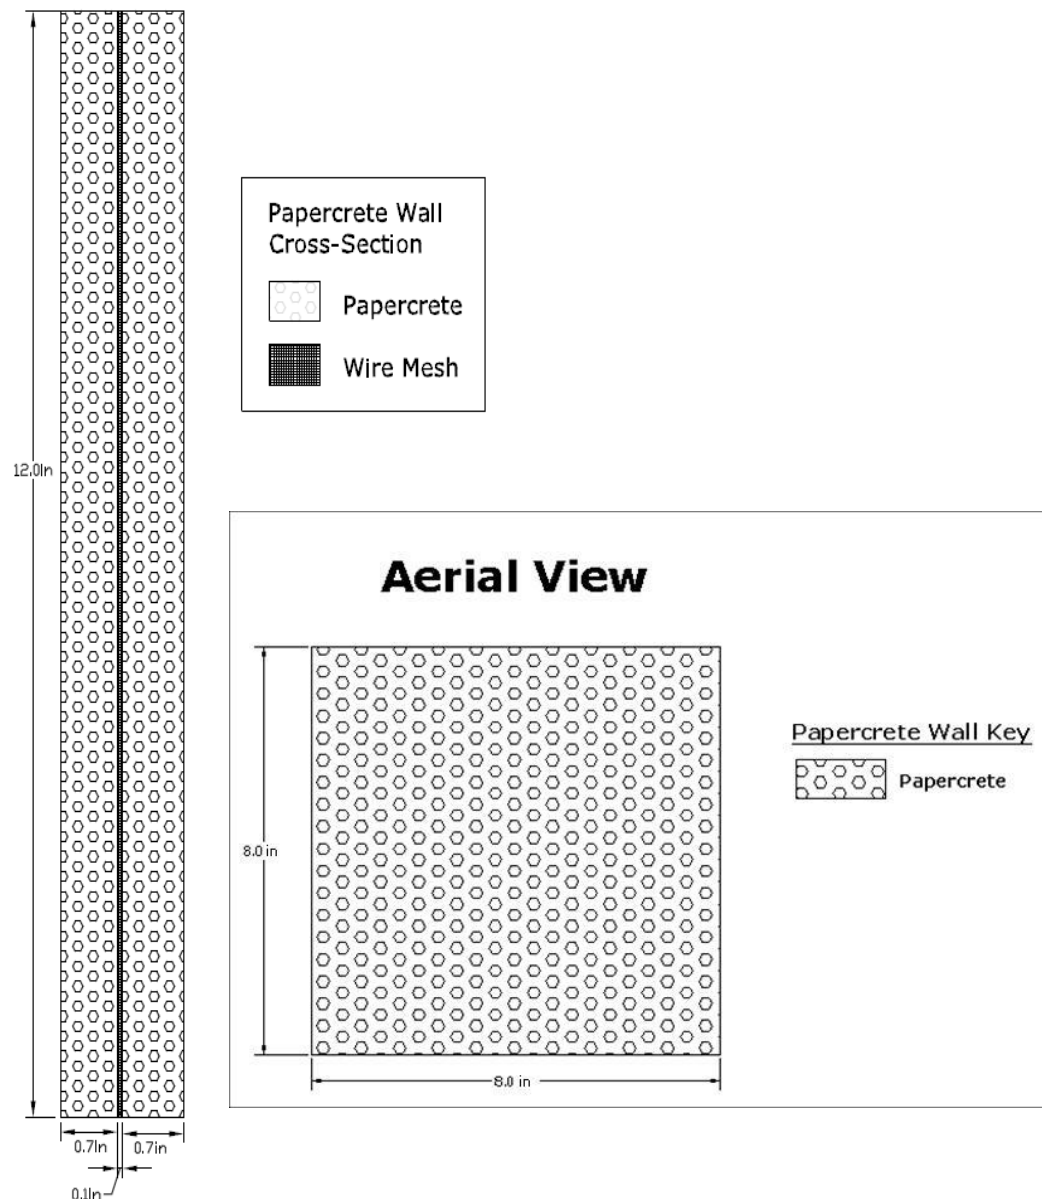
1: These two CAD drawings provide a cross-section and aerial view of the Papercrete wall, with exact dimensions scaled from feet to inches and material representative.
